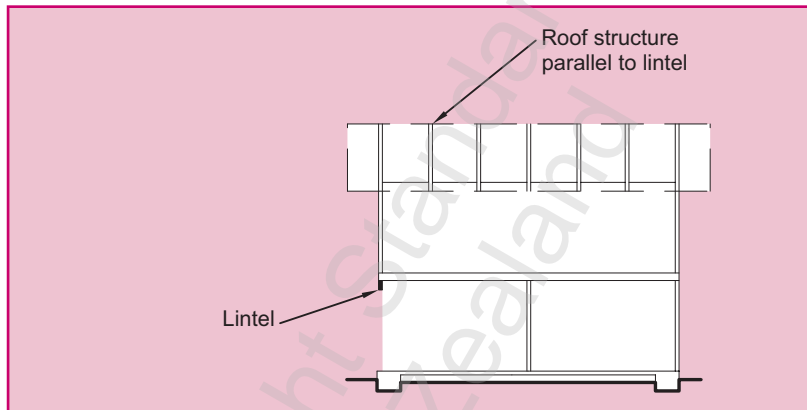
Lintel supporting wall and floor (truss parallel to lintel) (see 8.6.1.1 and table 8.12)
